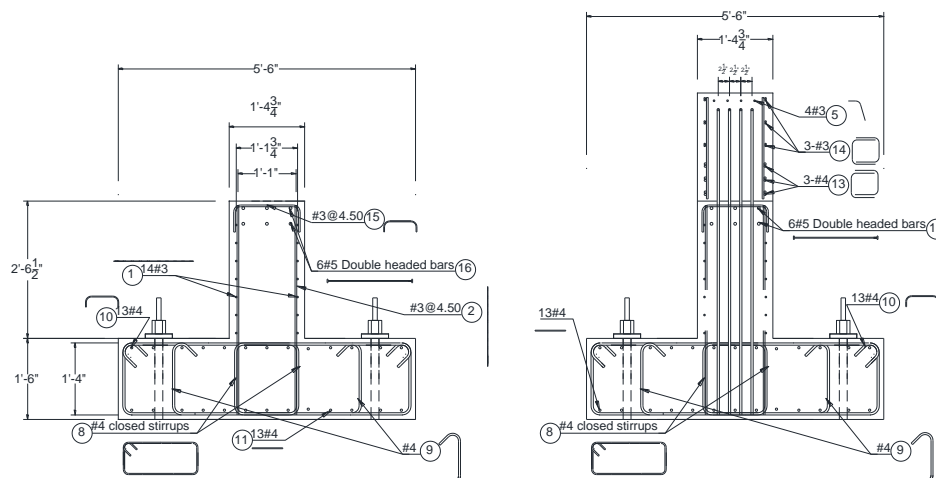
Sections G-G (left) and H-H (right) in design drawing for Specimen 7 (see Figure 5.1 for the location of the sections)
